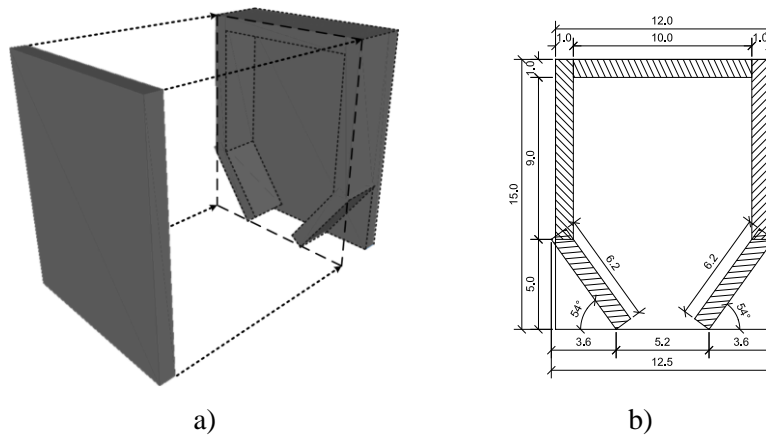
Hopper geometry: a) isometric view; b) cross-section – dimensions in meters
